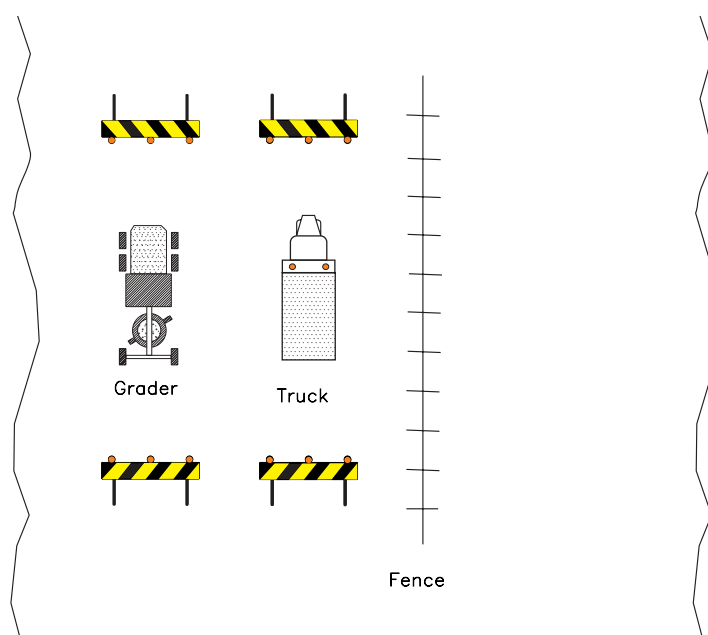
Method of worker protection when repairing plant on construction sites.
